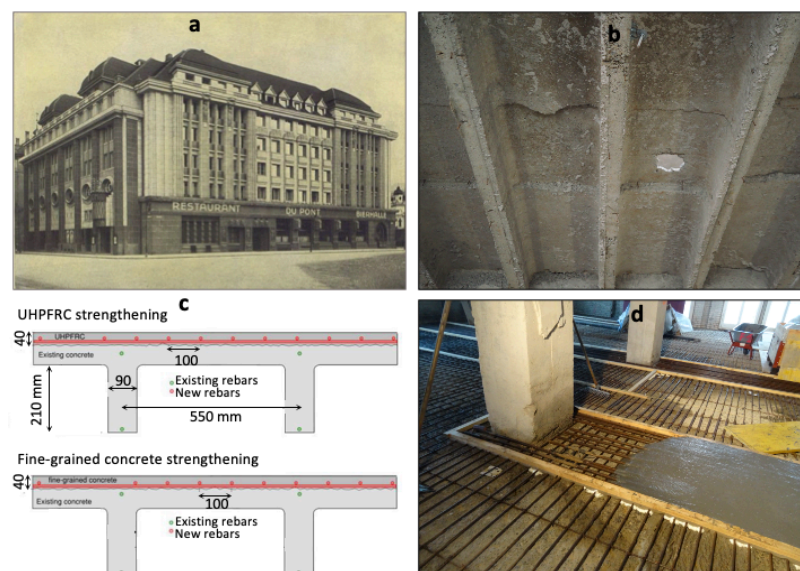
“Dupont” building: (a) Historic photograph of the building in 1914 (photo credit: J. Coulin); (b) existing ribbed slab before intervention; (c) intervention design, adapted from [13]; (d) casting of UHPFRC.
